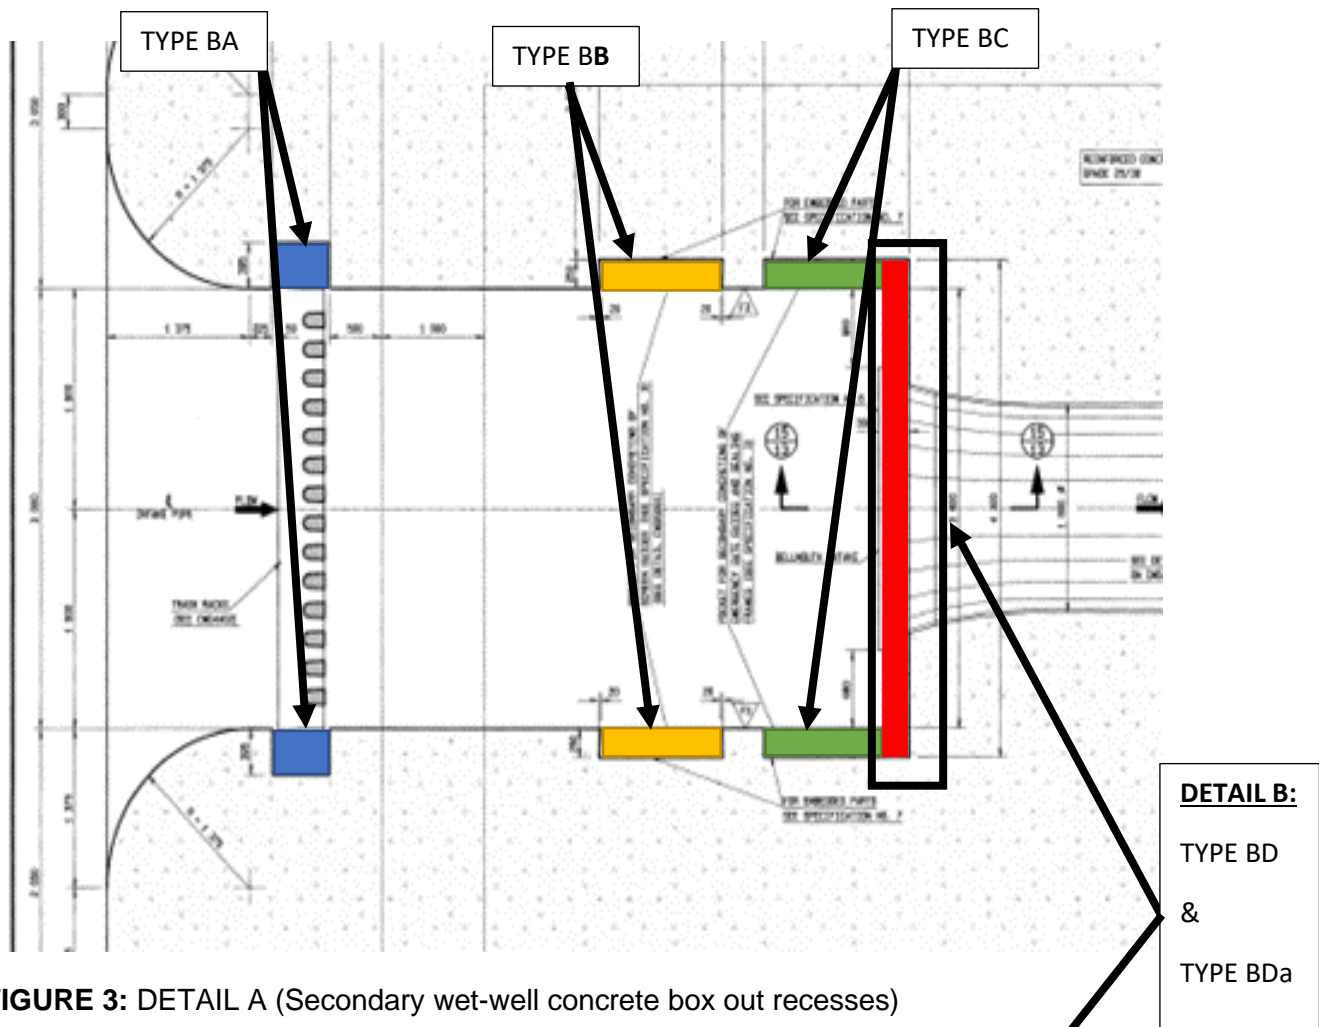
DETAIL A (Secondary wet-well concrete box out recesses)
